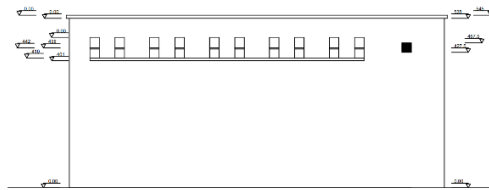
Boranhane facade (Drawer:Melek Geçirgen)
